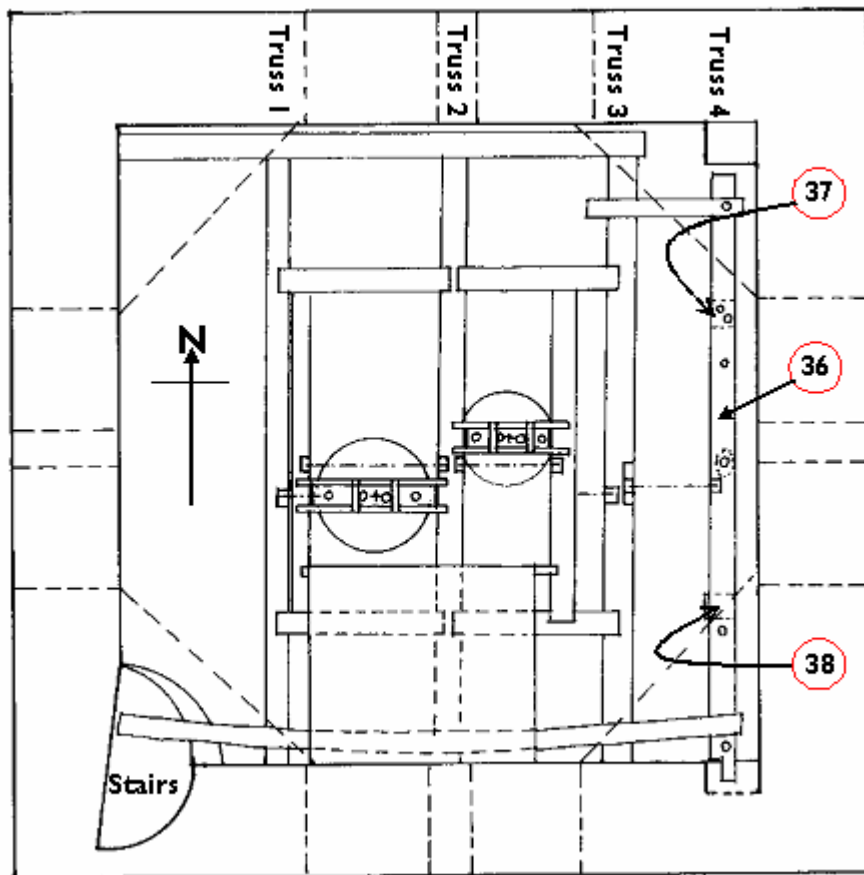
Plan of the bell chamber to show position of trusses and of sampled timbers (after Martin Roberts)
